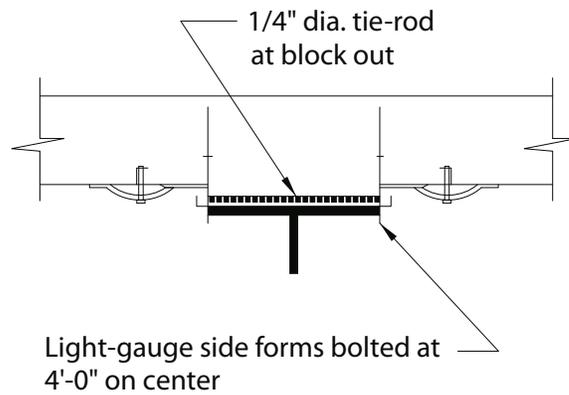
Grout dam built using light-gauge forms (Queen Elizabeth Way-Welland River Bridge, Ontario, Canada).
